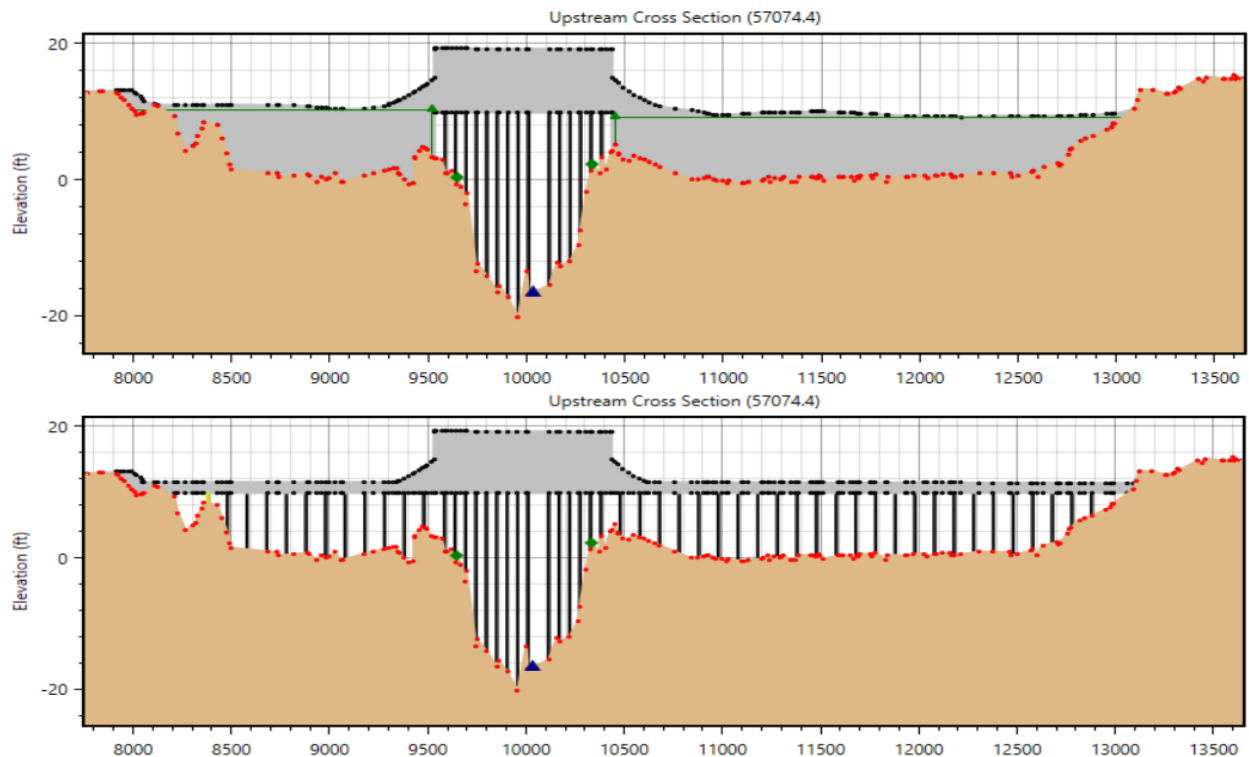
Existing (top) and modified (bottom) cross sections showing the embankment removed, extension of the bridge deck, and additional piers for the NC 43 in Craven County.
